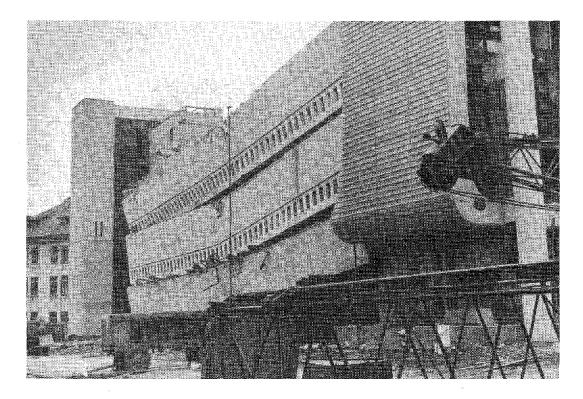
Stair towers standing adjacent to collapsed main building, Computing Center, Bucharest, 1977 Romania Earthquake. (Photo courtesy of Glen V. Berg.)
